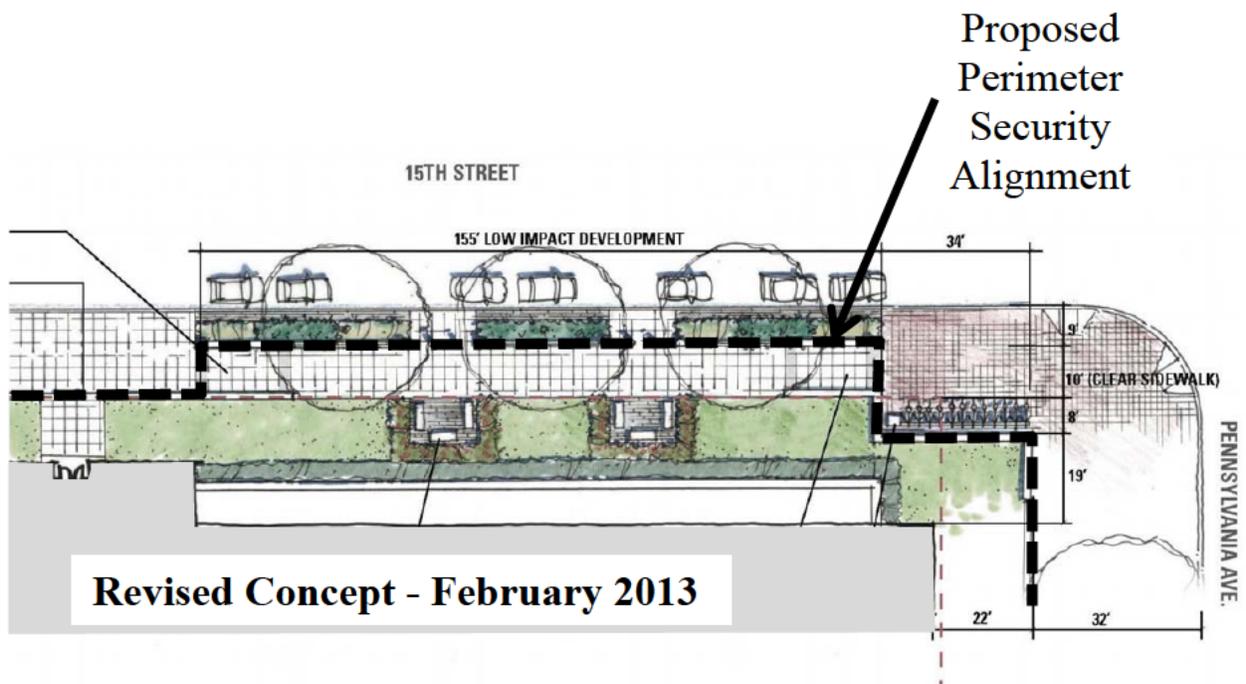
Revised Concept Site Plan Detail - 15th Street, NW
